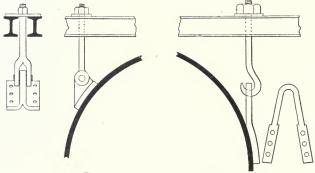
Fig. 7. Two Methods of Supporting Bollers by Suspending from Overhead Beams. It is better to have the rivets both above and below the flange, as shown in Fig. 5.
